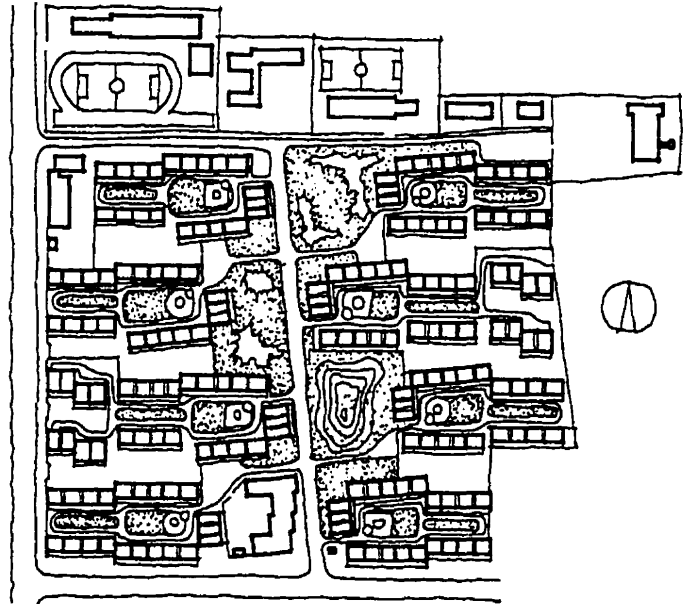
Site Plan of Fu-qiang-xi-li
